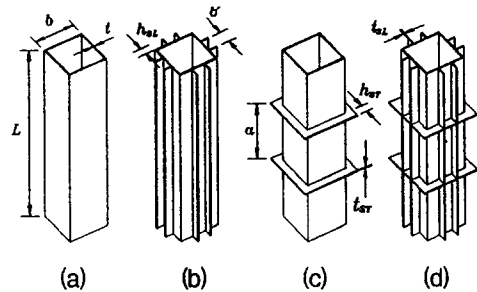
Configuration of test specimens: (a) unstiffened (US), (b) longitudinally stiffened (LS), (c) transversely stiffened (TS), and (d) orthogonally stiffened (OS)specimens.
